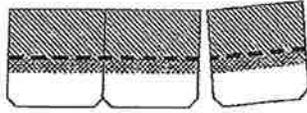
Shadow Ridge accessory shingles detach easily from three-piece units to make 72 individual cap pieces.
